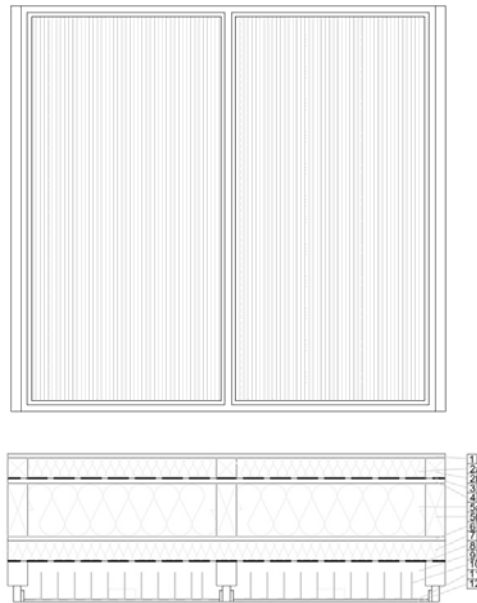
design of the frontal view and horizontal section of the prototype. The horizontal section is made of the following layers :
